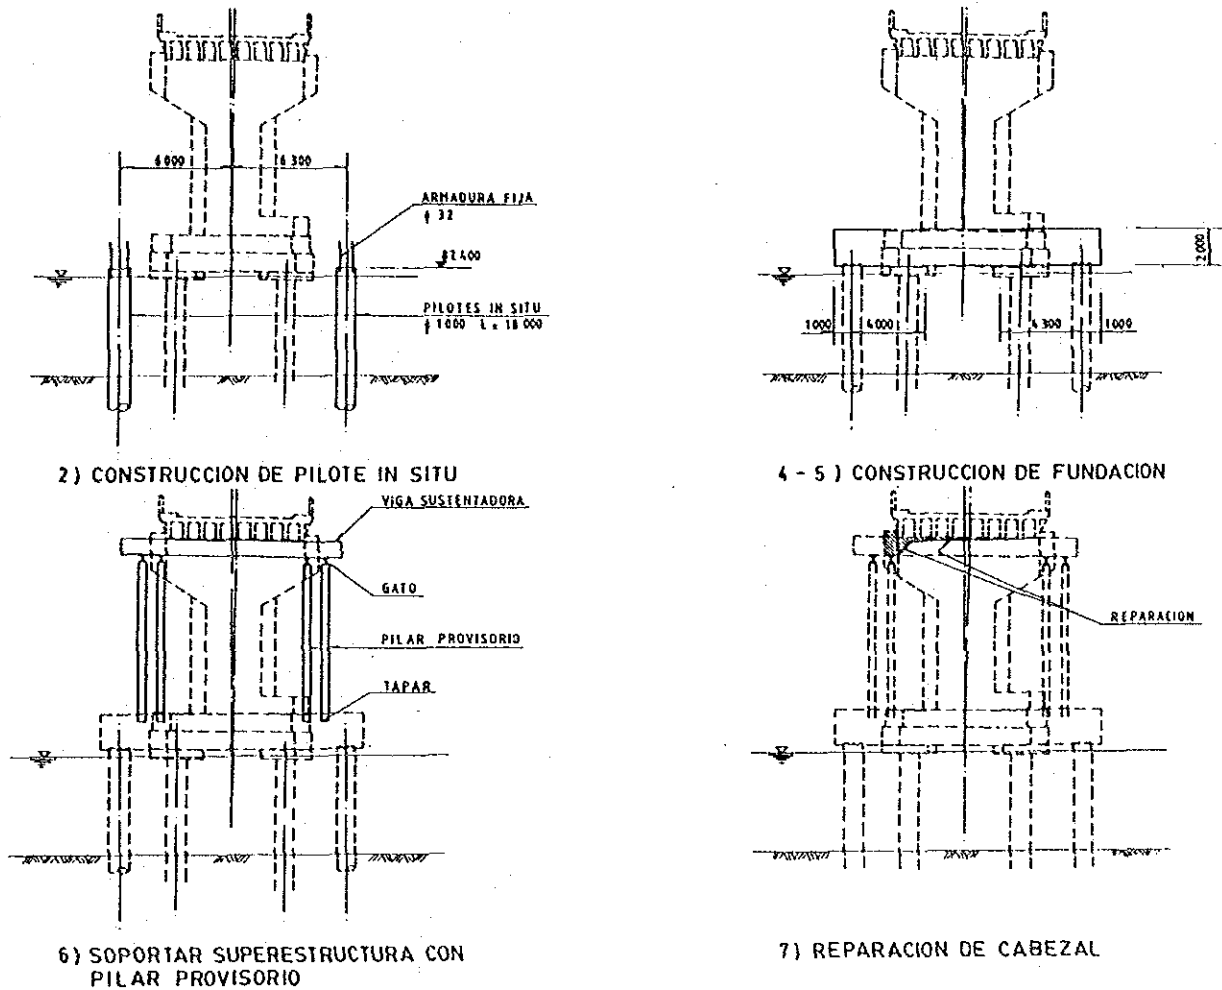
Reinforcement of Substructure by Cast-in-Place Pile
